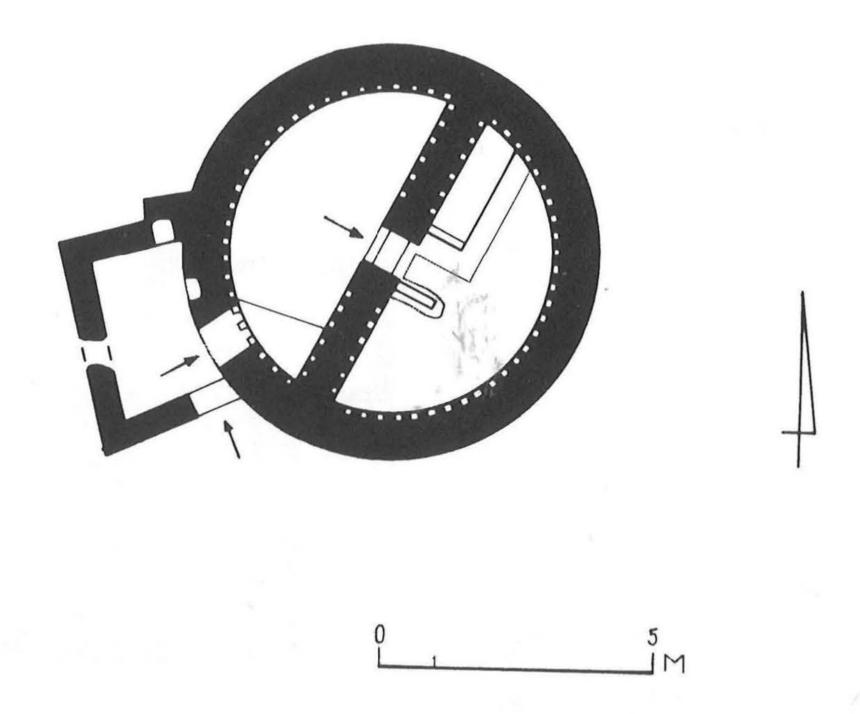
Plan of Cell 11 in the Columbarium (after Masada III, Plan 29).
